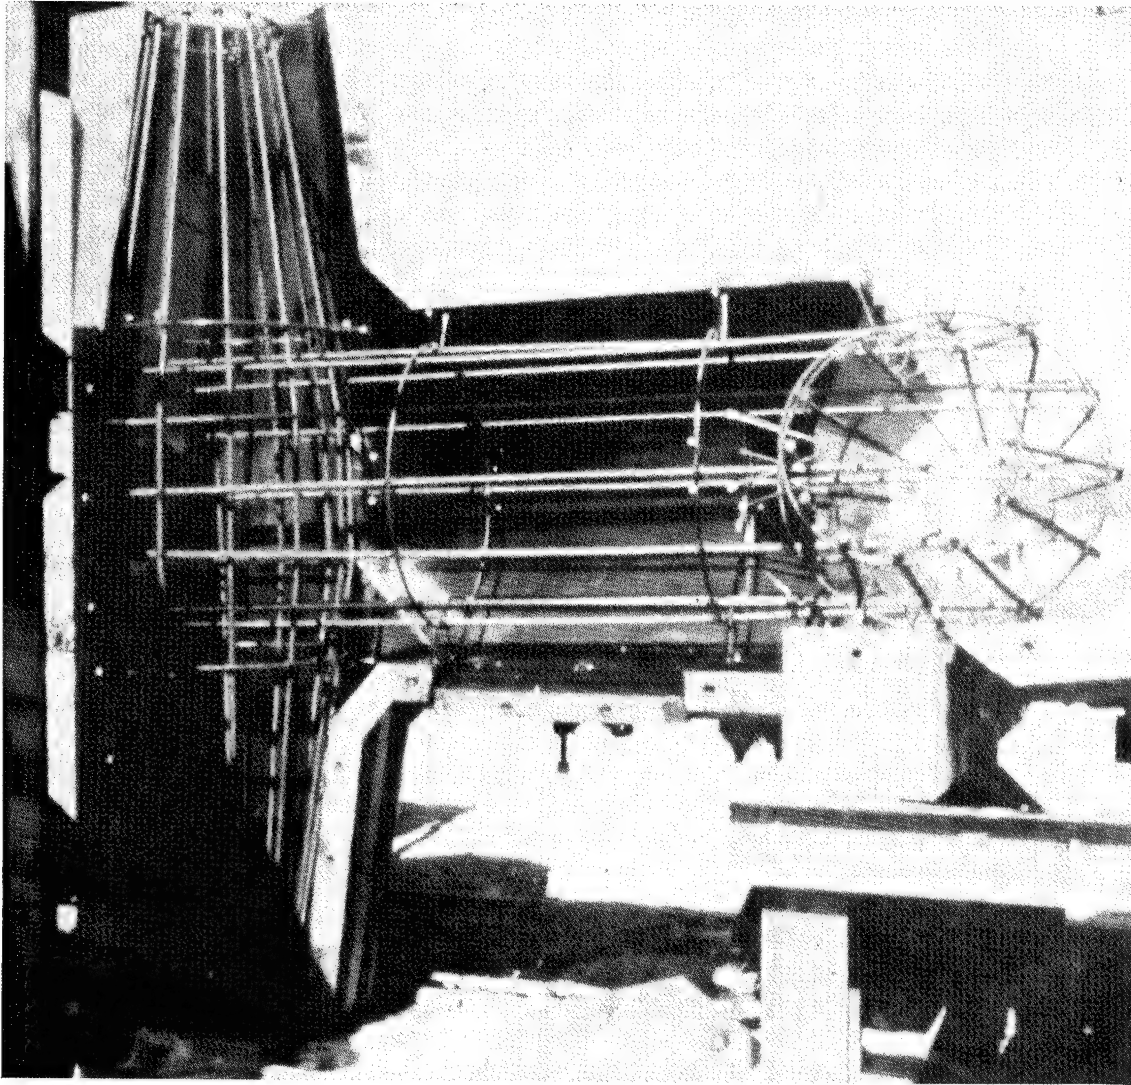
Epoxy-coated, steel reinforcing rods used in dolosse
